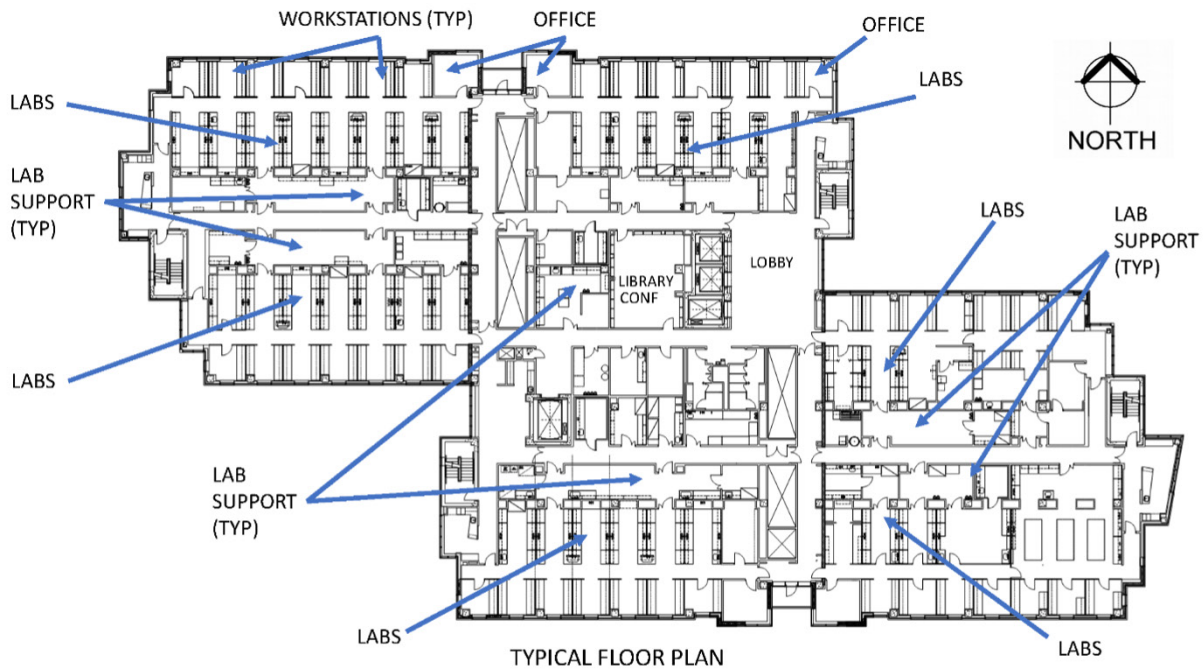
A typical floor plan for Building 50. Source: Kutlak & Carlisle 2001; original design by HLM Design, Inc.; redrawn by present author.
